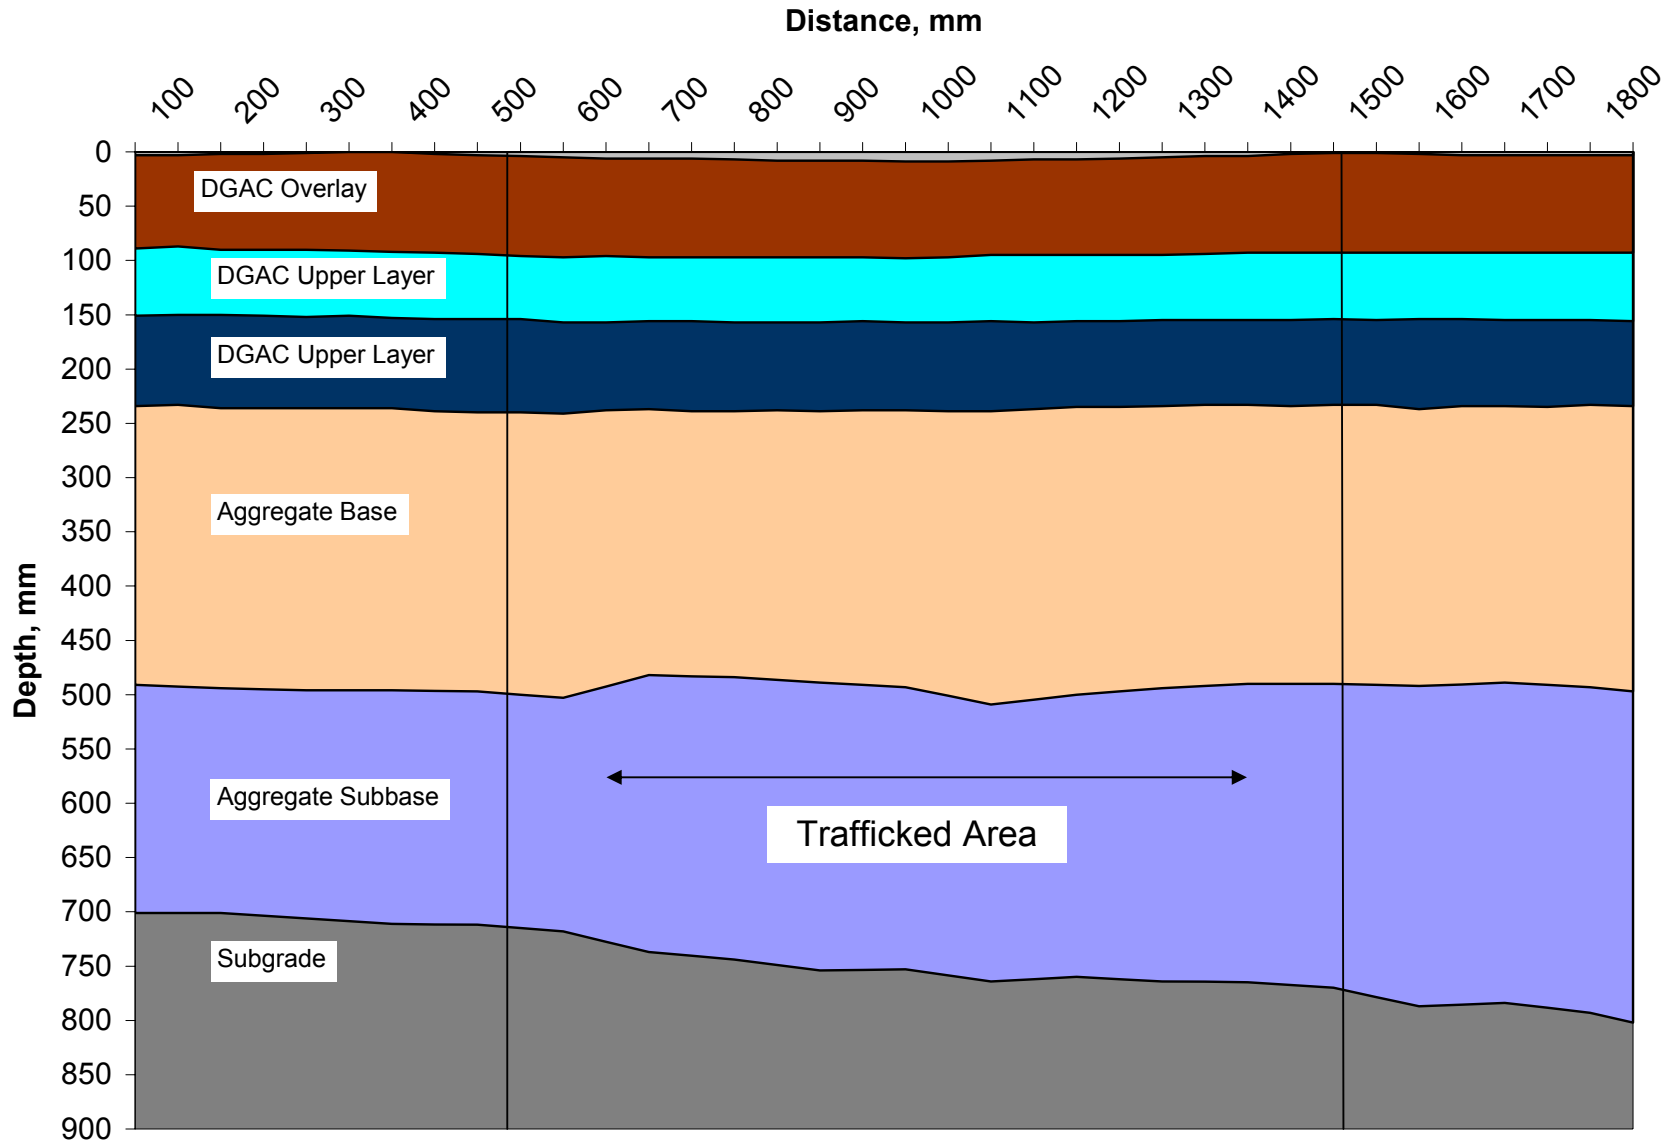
Trench data, south face of trench at Station 12, Section 545.
